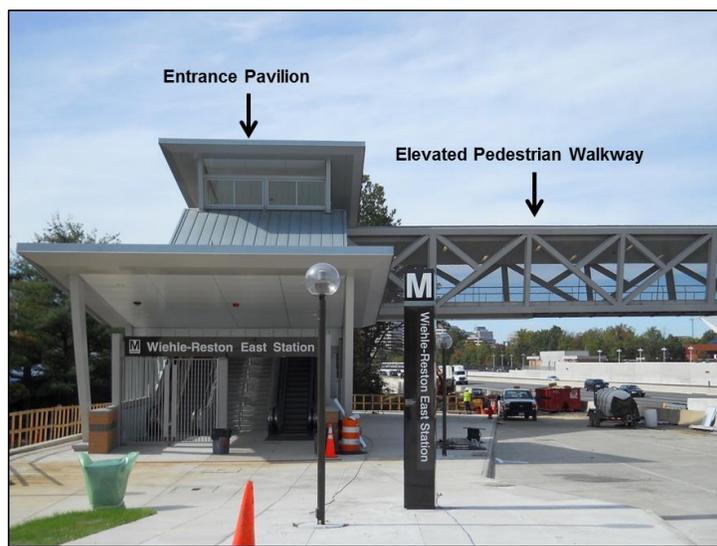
Entrance Pavilion and elevated pedestrian walkway at the Wiehle-Reston East station, Source: Applicants' photograph
